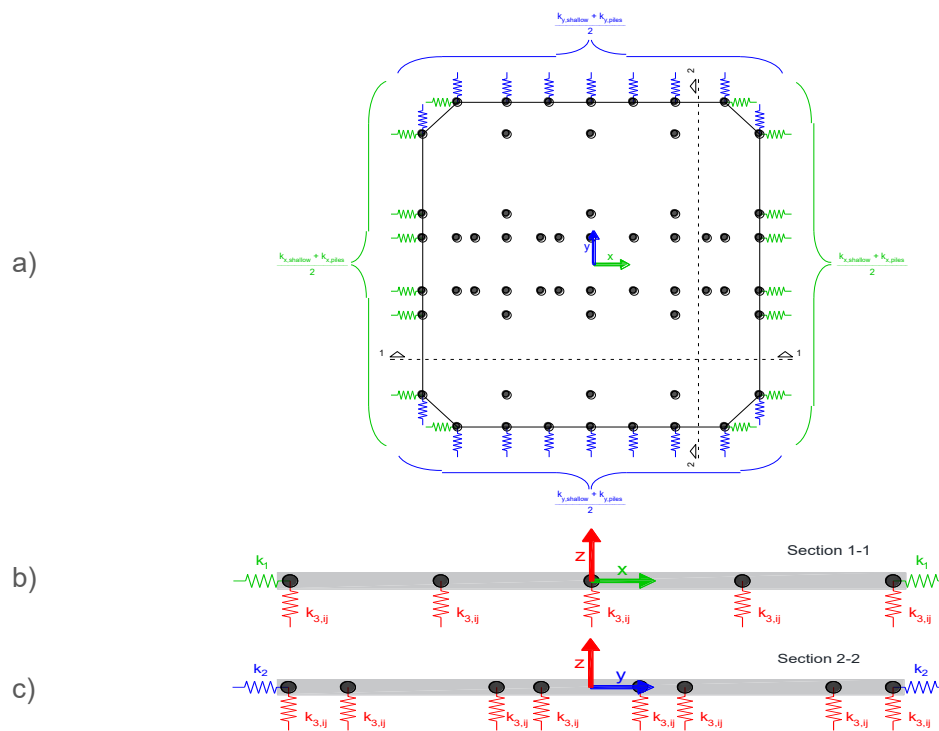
Distribution of horizontal and vertical springs: a) plan view; b) section 1-1; c) section 2-2
